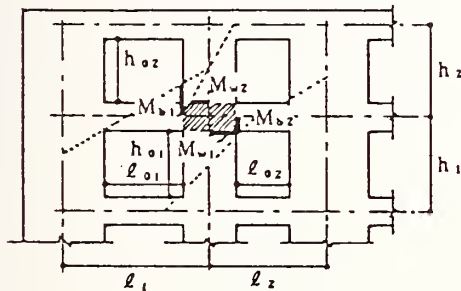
Notation for Design of Bearing Wall-Wall Girder Joint
